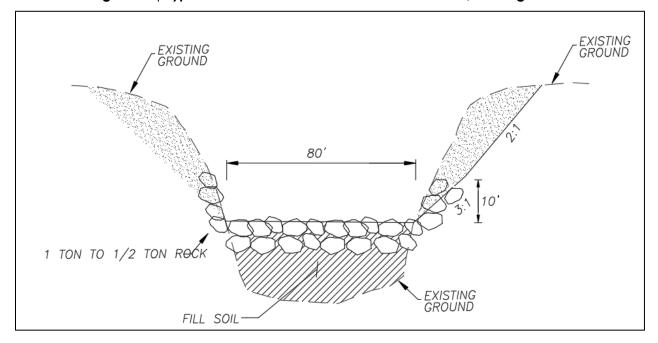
| Typical Rock Stabilization Structure Cross Section, Looking Downstream
